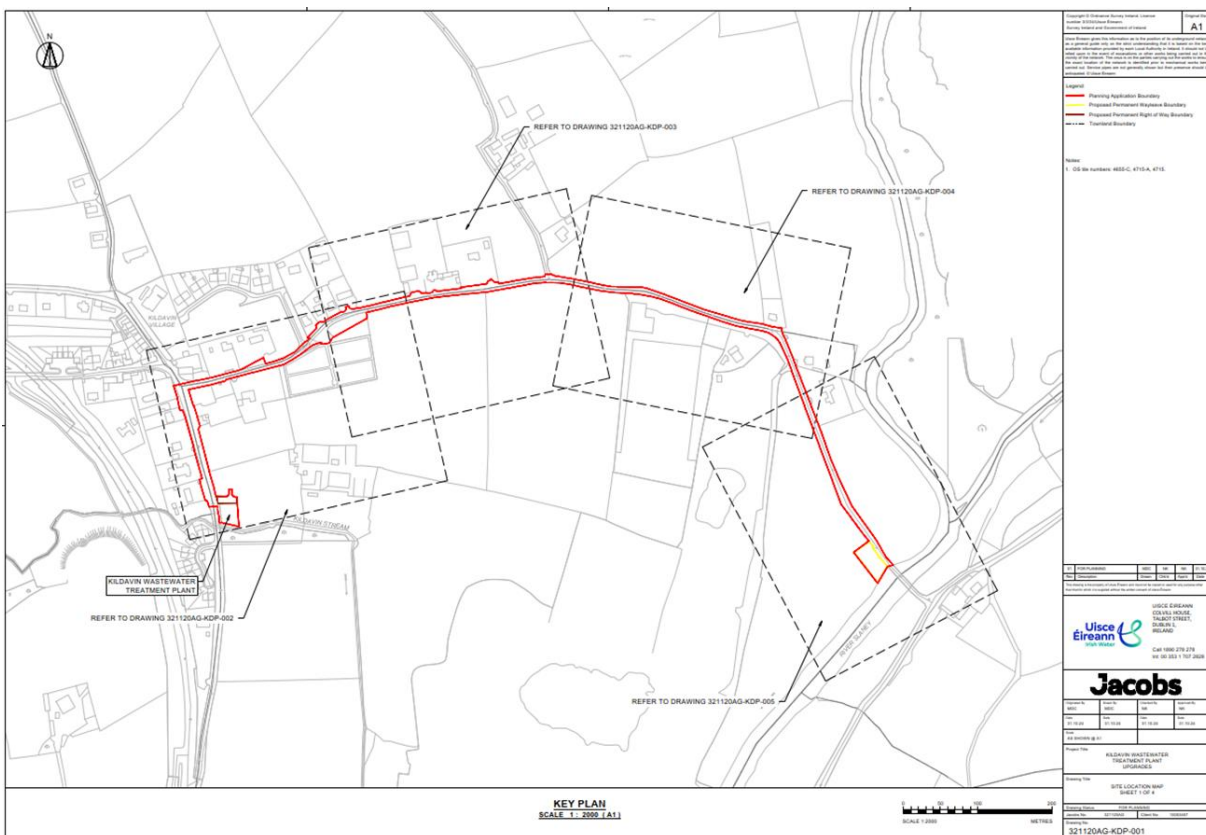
Location and route of Proposed Project. The red line indicates the pipeline route, running from Kildavin WWTP to the proposed new outfall located on the riverbank of River Slaney.
